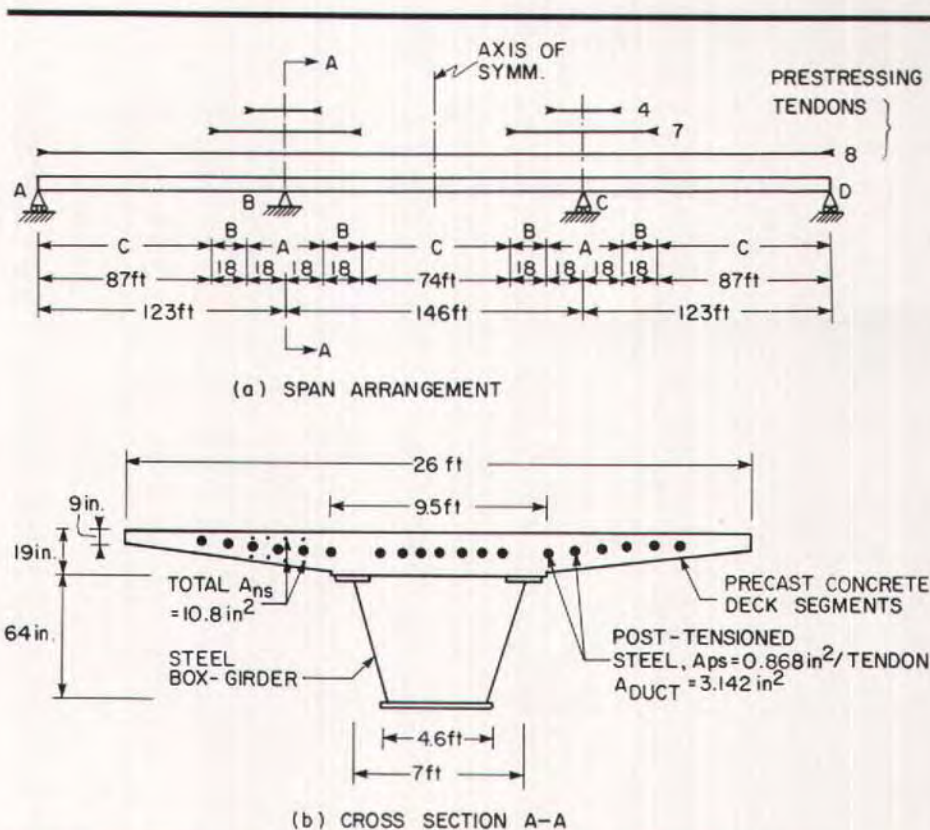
Three-span composite concrete-steel bridge (Example 1). Note: 1 in. = 25.4 mm; 1 in.<sup>2</sup> = 645.2 mm<sup>2</sup>; 1 ft = 0.3048 m.
